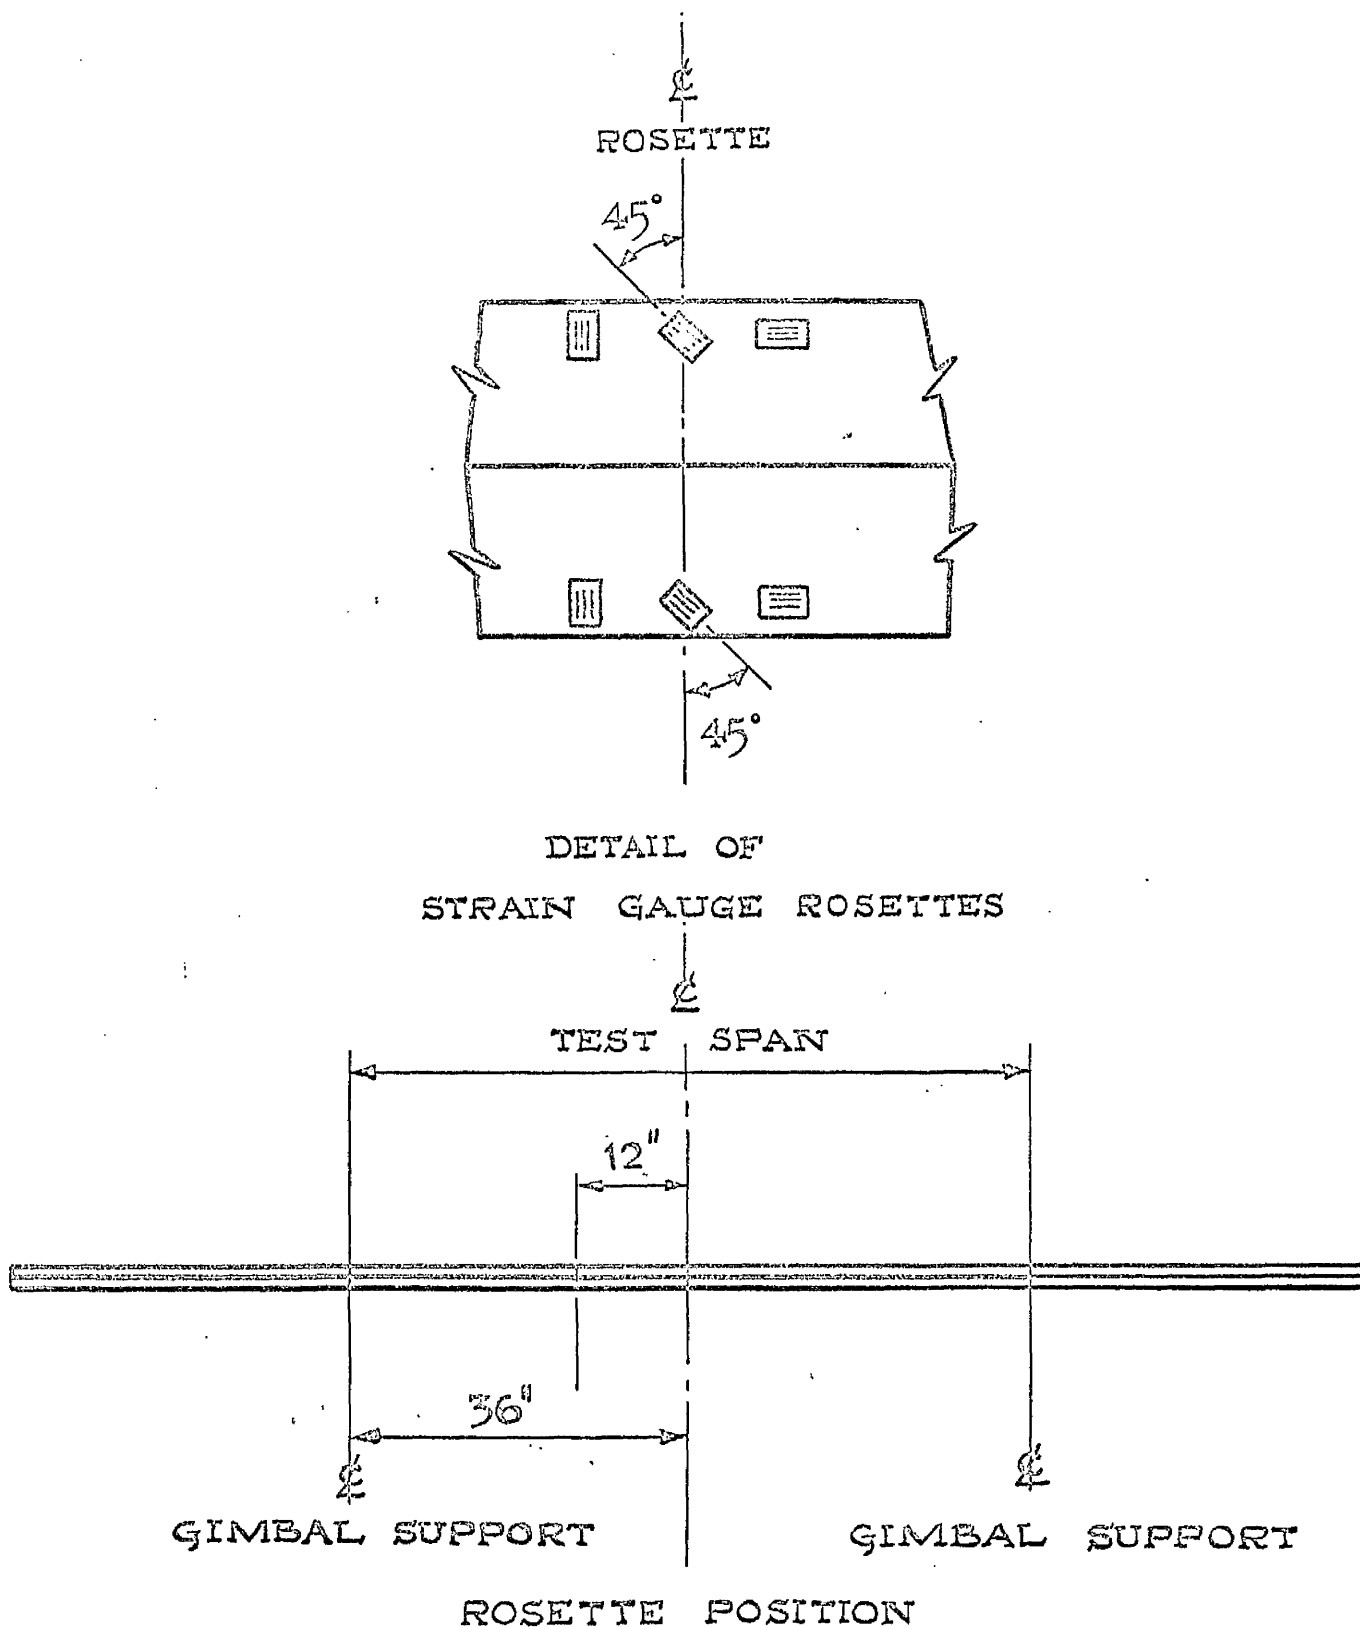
DETAILS OF STRAIN GAUGE ROSETTES AND LOCATION OF STRAIN GAUGED SECTIONS IN THE BRASS ANGLE TEST SPECIMENS.
